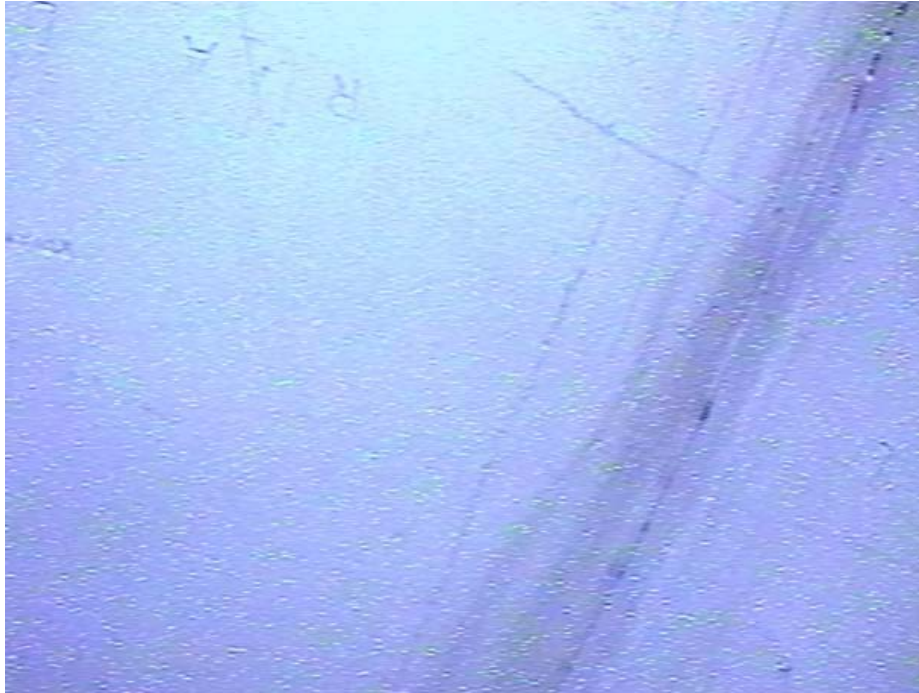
Inside fuel tube D-5 at the midway of the tube. View as typical of all fuel tubes.
